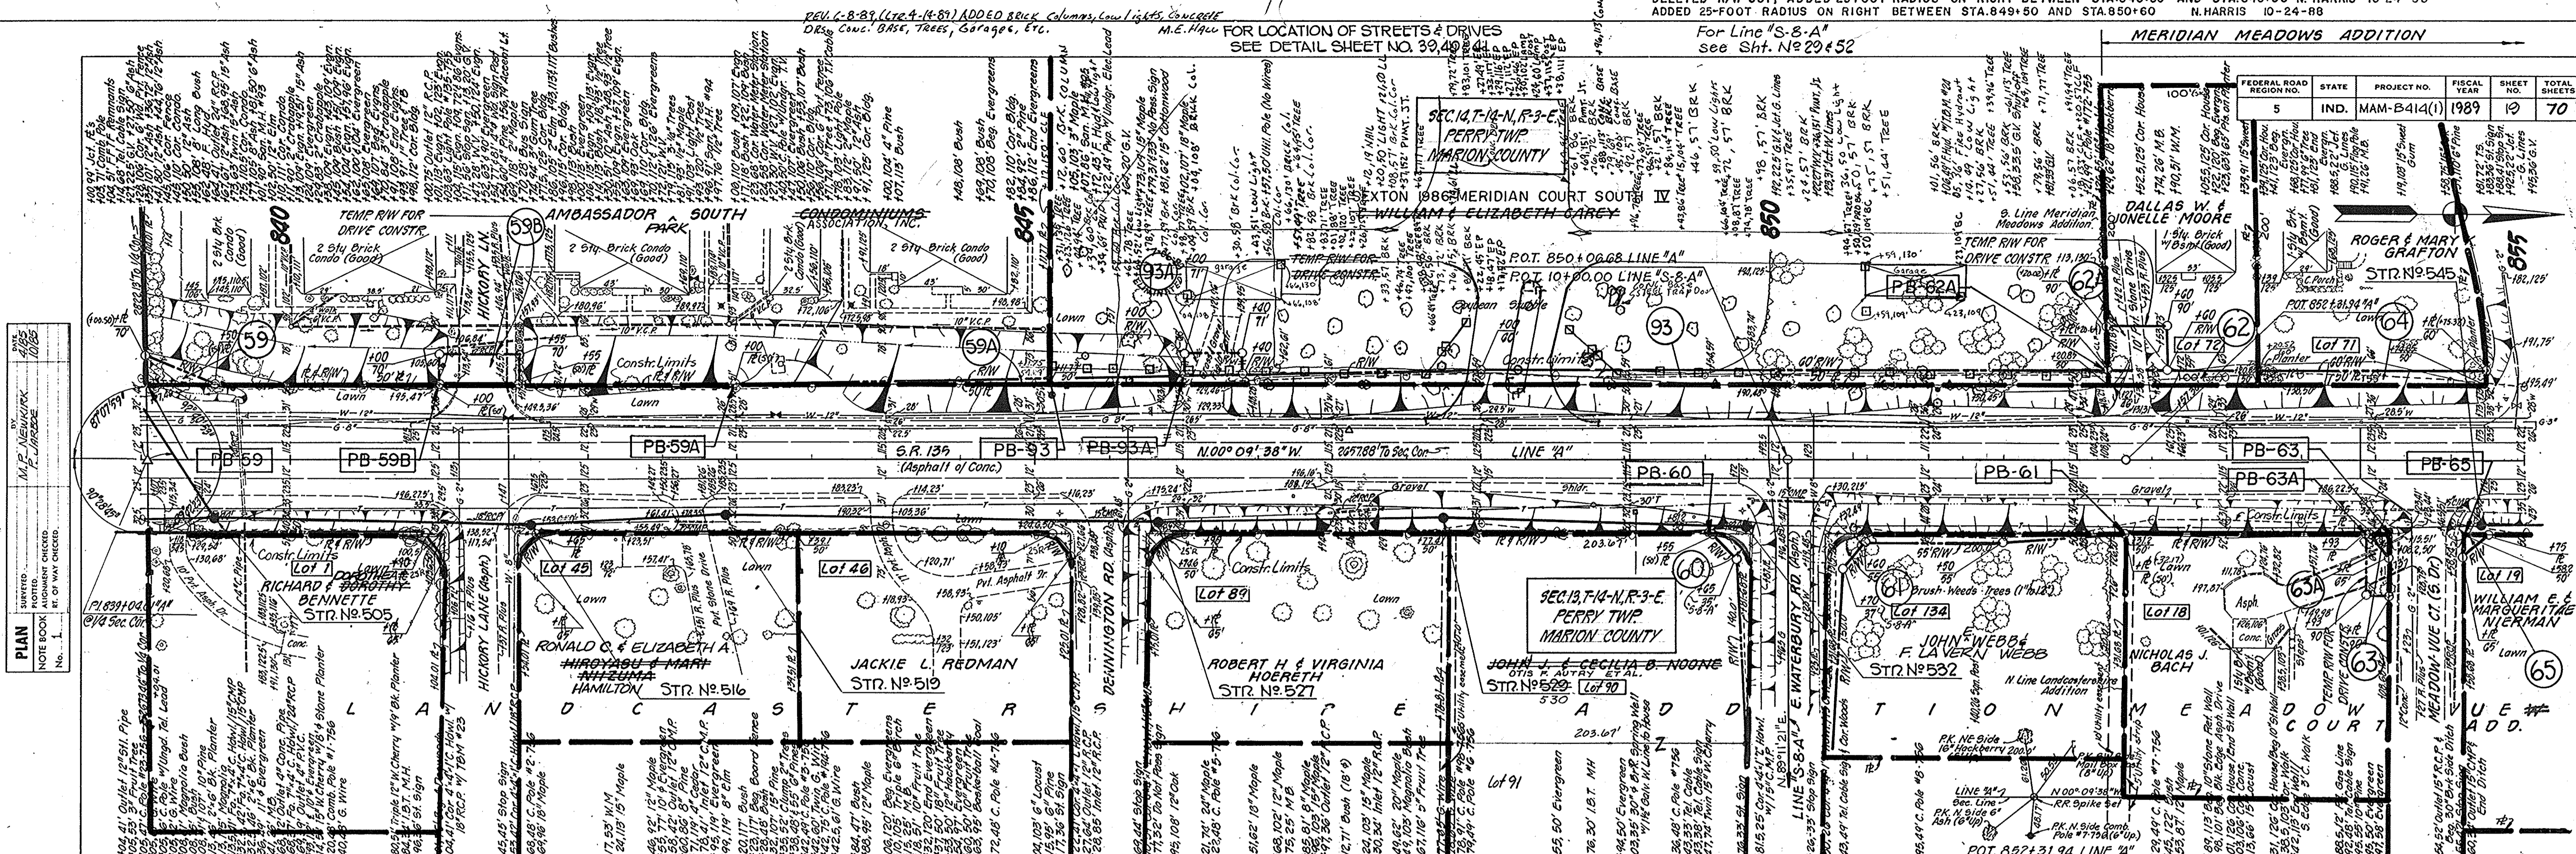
PLAN - PROFILE D. R. STANDARD
